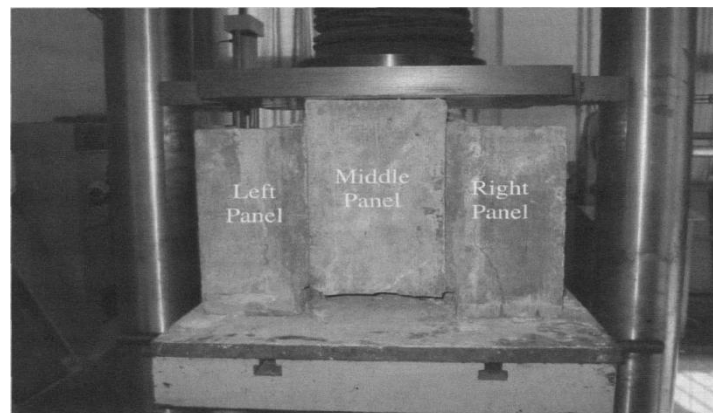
Laboratory setup for testing the connection strength of three concrete panels
